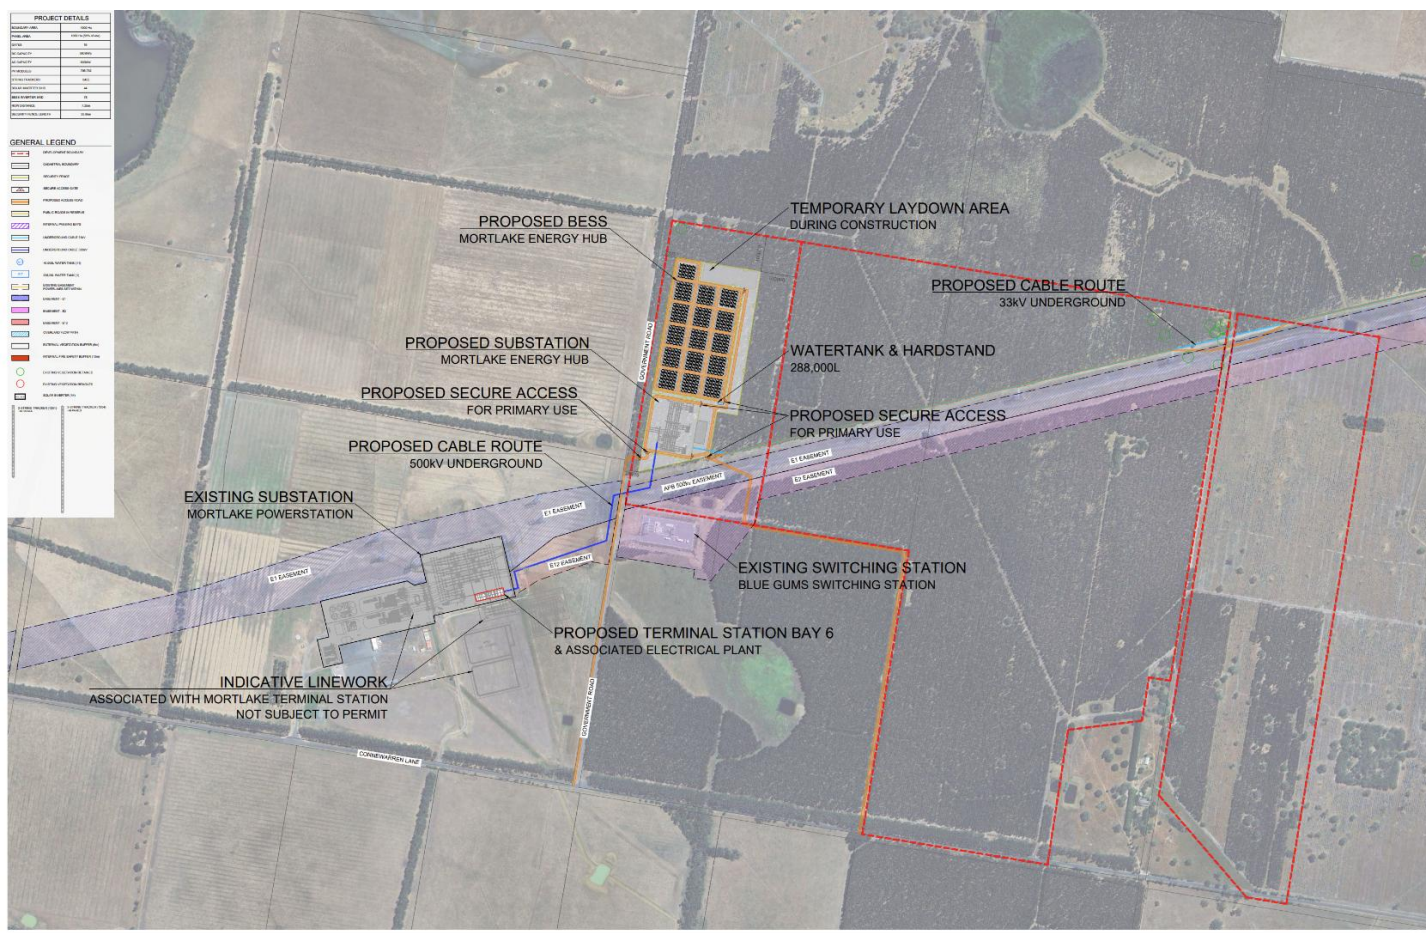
Overlay of the Site Layout Plan and Proposed Plan of Subdivision (Source: Decision Plans)
